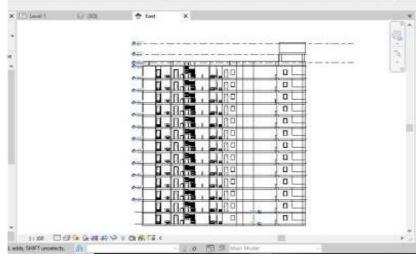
3D PLAN DESIGNED ELEVATION IN REVIT
